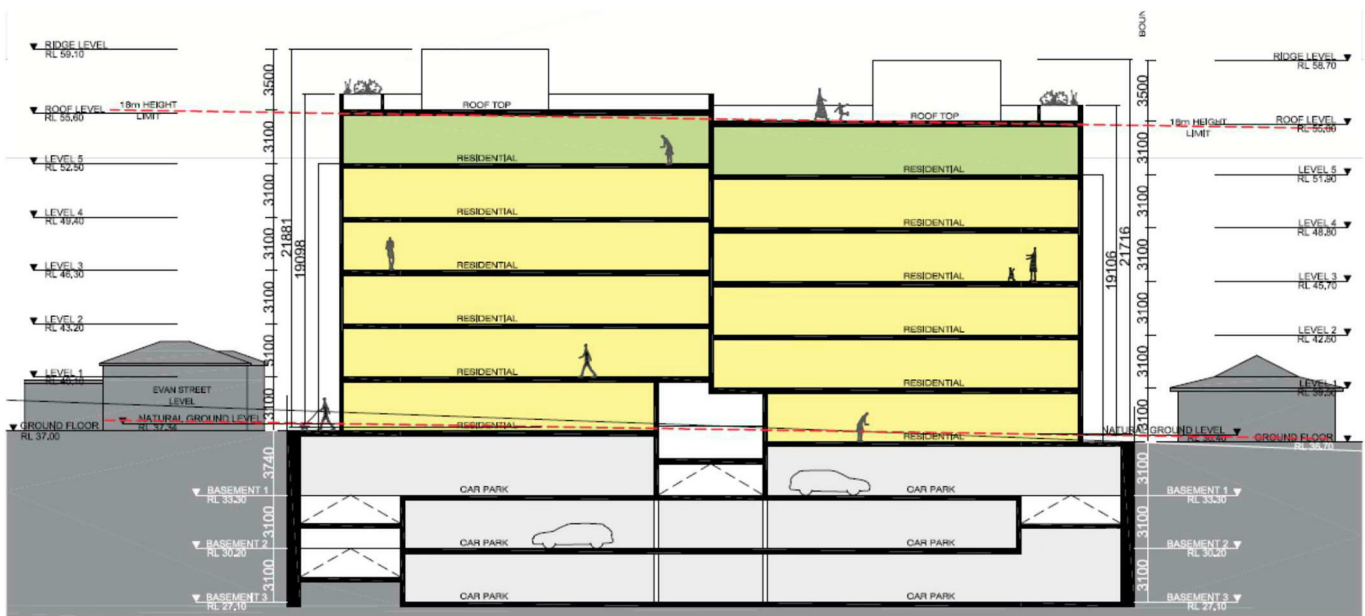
Section B demonstrating the proposal's varied maximum building height
